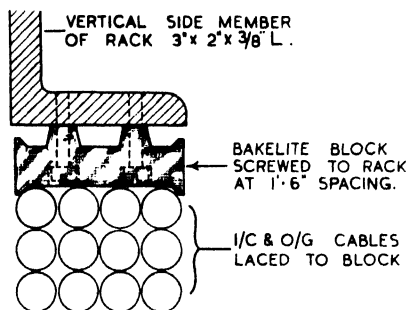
ATTACHMENT OF CABLES TO RACK UPRIGHTS
